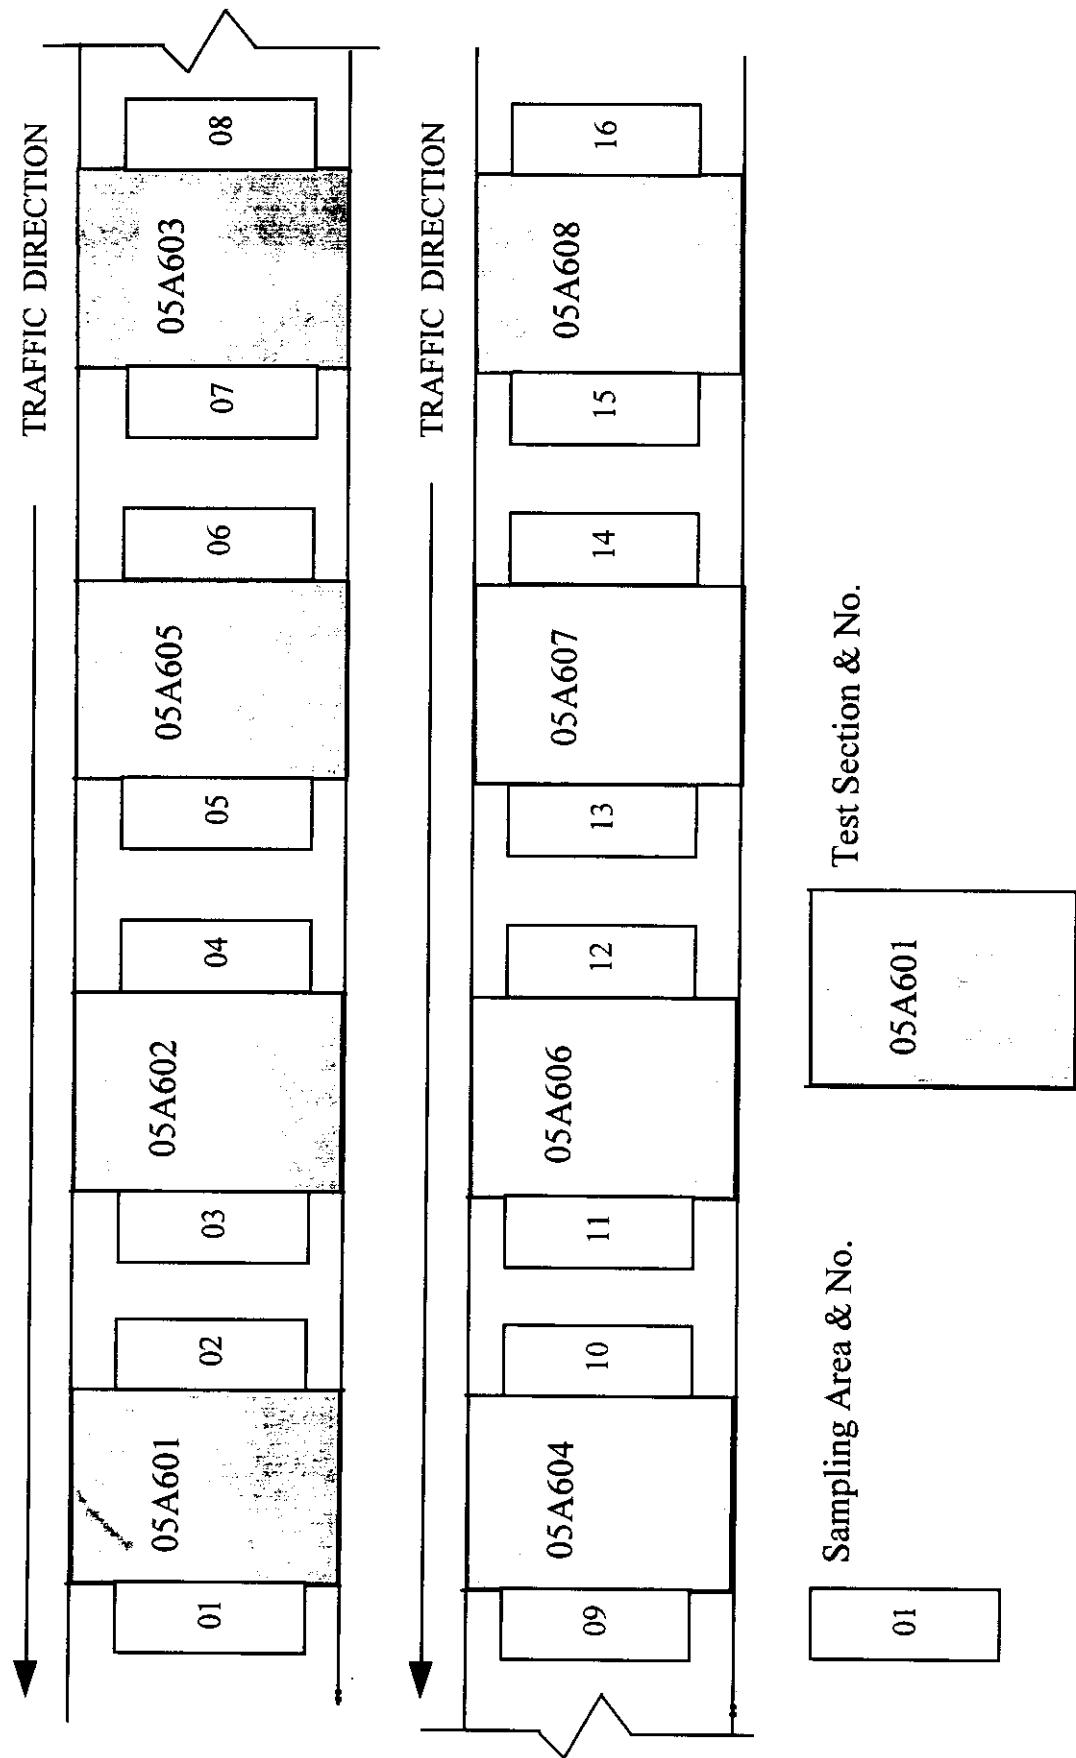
SITE LAYOUT WITH SAMPLING AREA LOCATIONS
